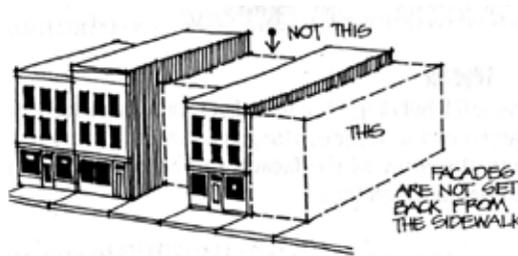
New, infill buildings should be set approximately the same distance from the road as adjacent buildings.
